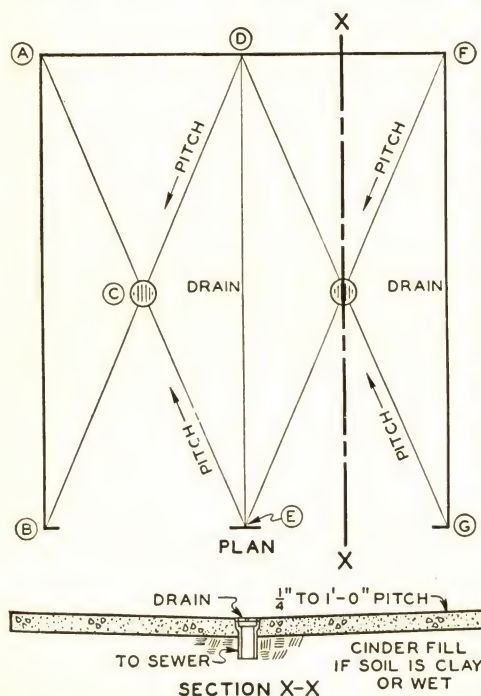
Details of Pitch to Facilitate Draining of Concrete Garage and Basement Floors
